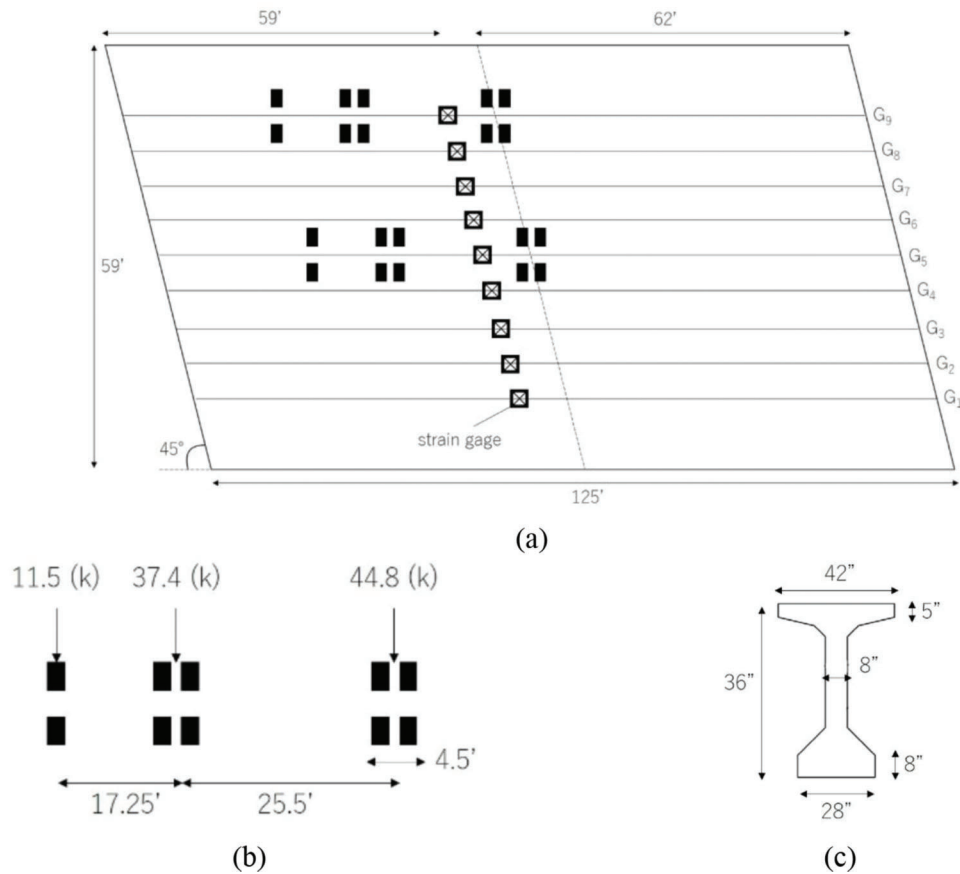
Test details: (a) bridge configuration, (b) truck load, and (c) girder dimensions.
